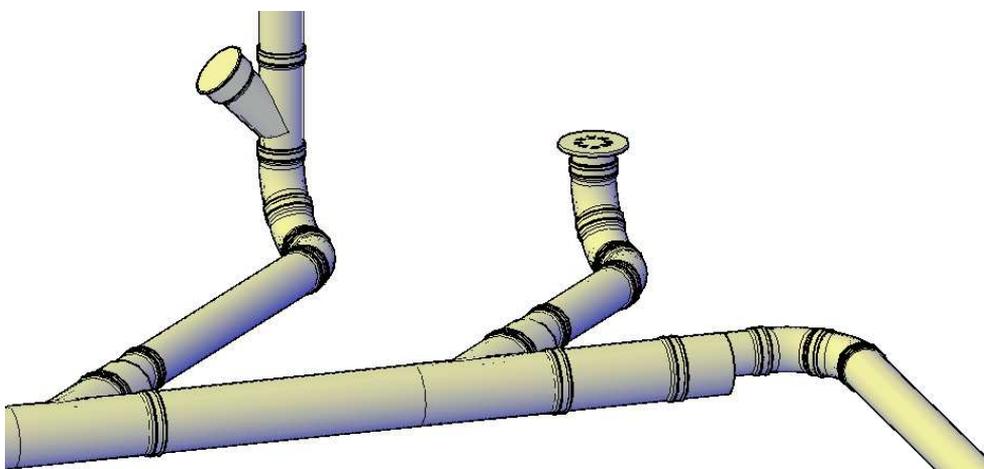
Building main sewer with visible reduction, floor drain and the sewage stack
